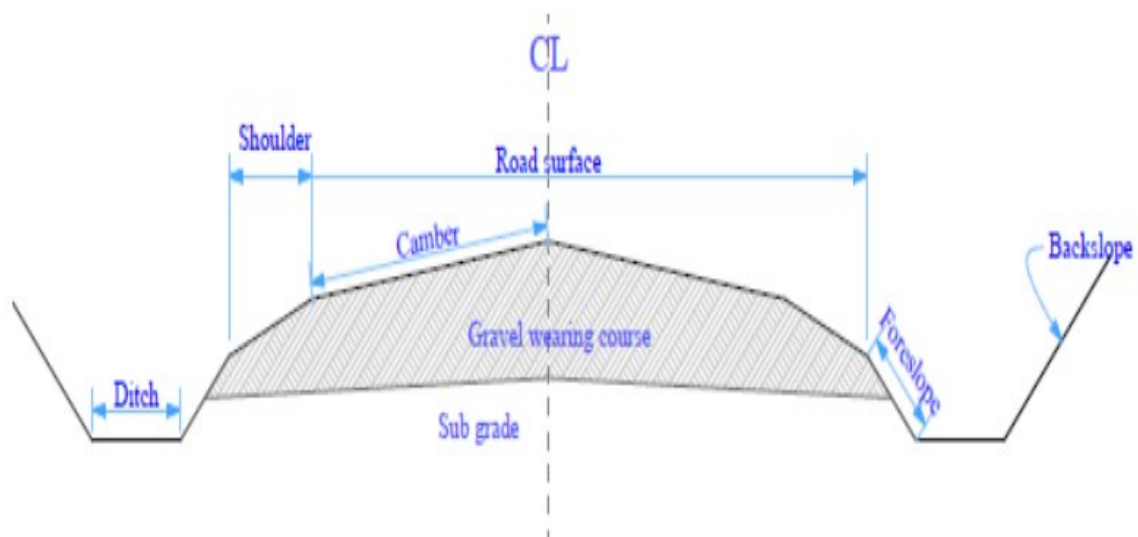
Elements of gravel roadway cross section (source: ERA LVR section D)
